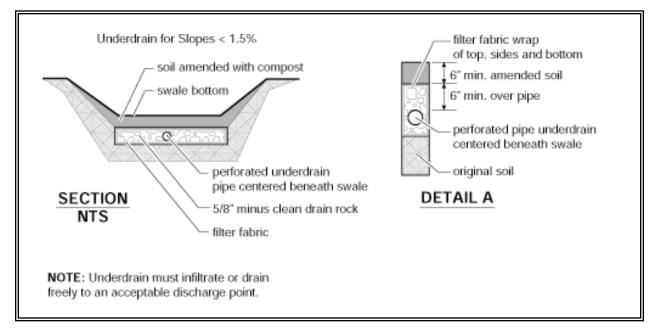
Biofiltration Swale Underdrain Detail
